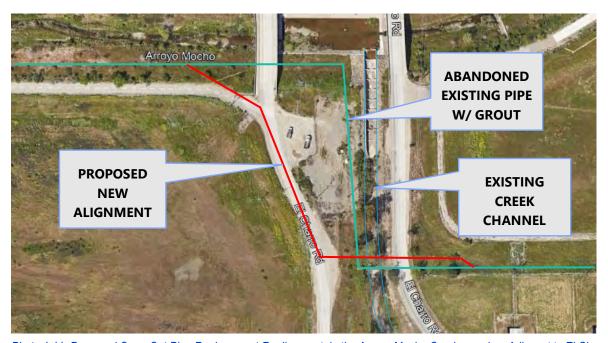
Proposed Open Cut Pipe Replacement Realignment in the Arroyo Mocho Creek crossing. Adjacent to El Charro Rd.
